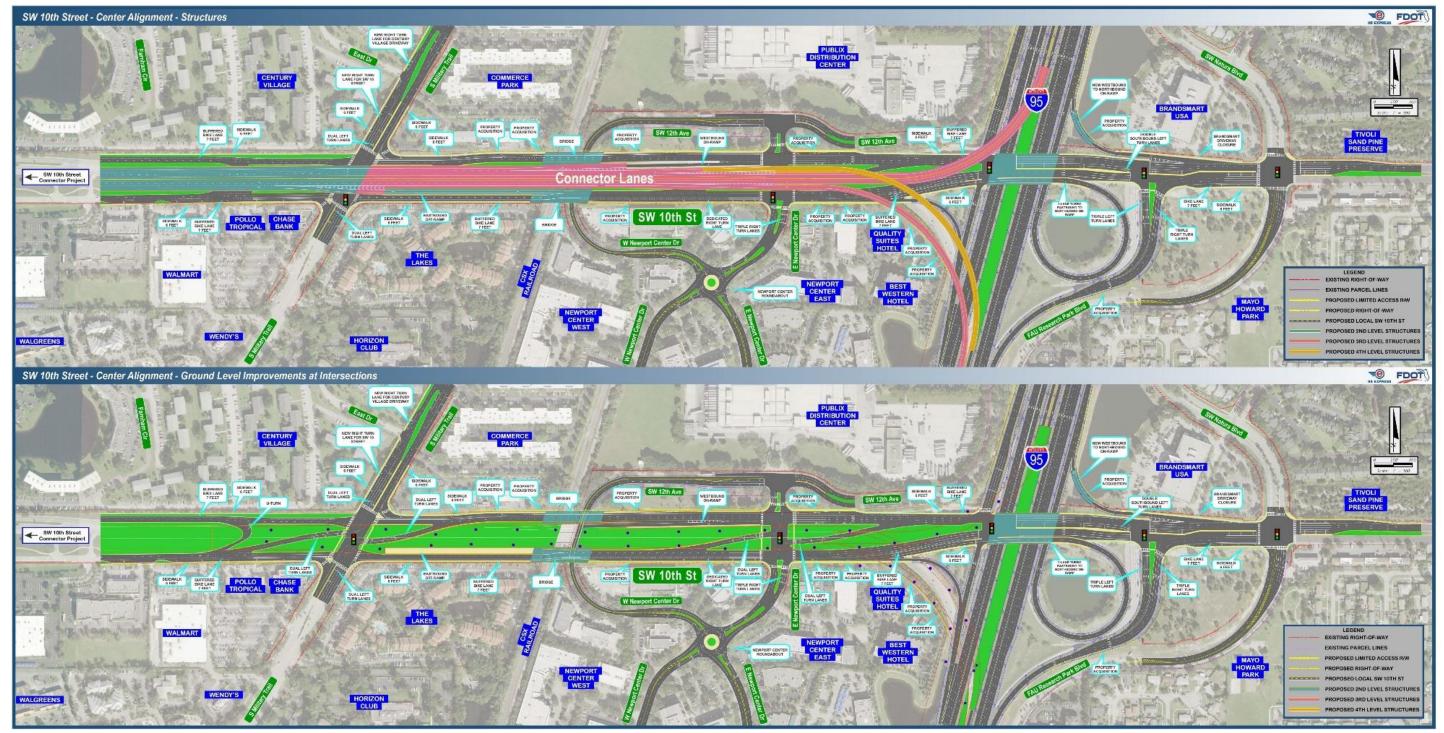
4: SW 10<sup>th</sup> Street – Center Alignment Concept Plan
